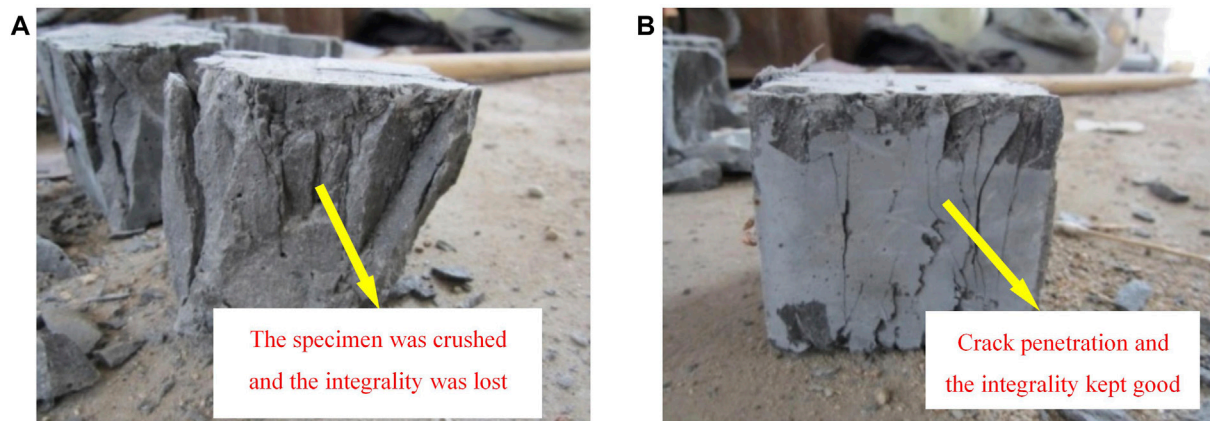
| Failure mode of specimen. (A) Failure mode of specimens without steel fiber; (B) failure mode of specimens with steel fiber.
